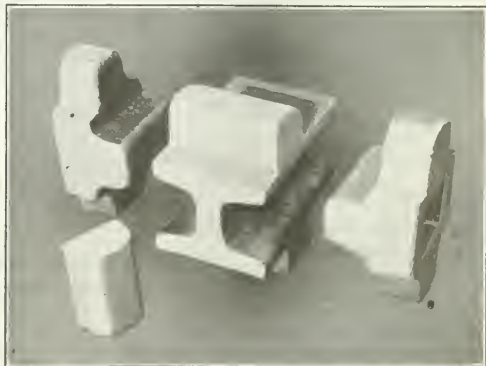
DETAILS OF PILLOW BLOCKS AND FILLERS USED IN SECTIONAL CONCRETE RETAINING WALLS
